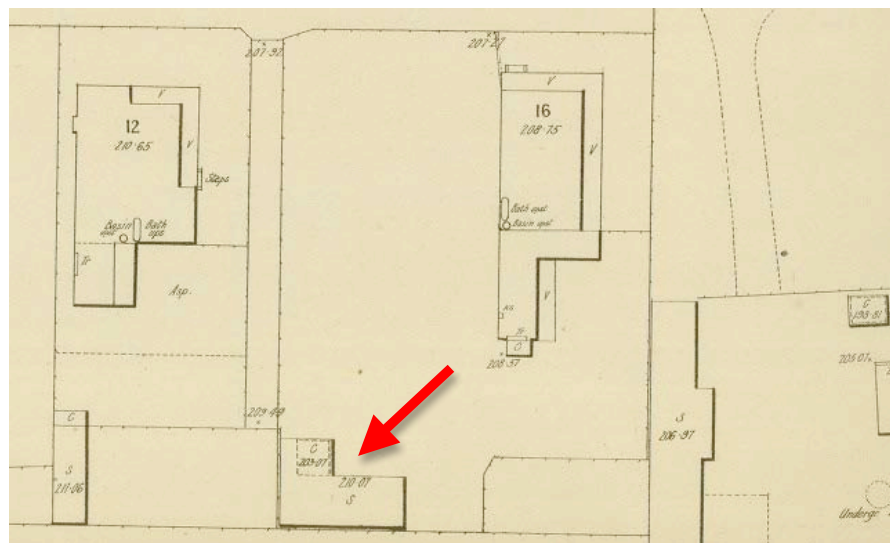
Part of a 1902 MMBW Detail Plan showing the Sorrett Avenue stables (then belonging to the house at 16 Sorrett Avenue). Source: State Library of Victoria.
